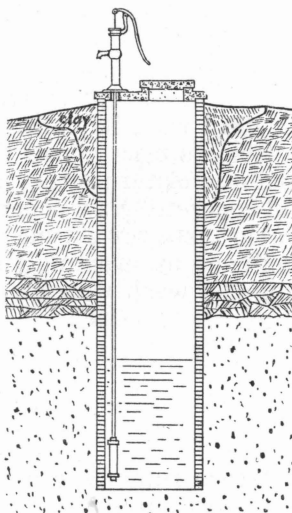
A well protected by a concrete top and bricks laid in mortar.
